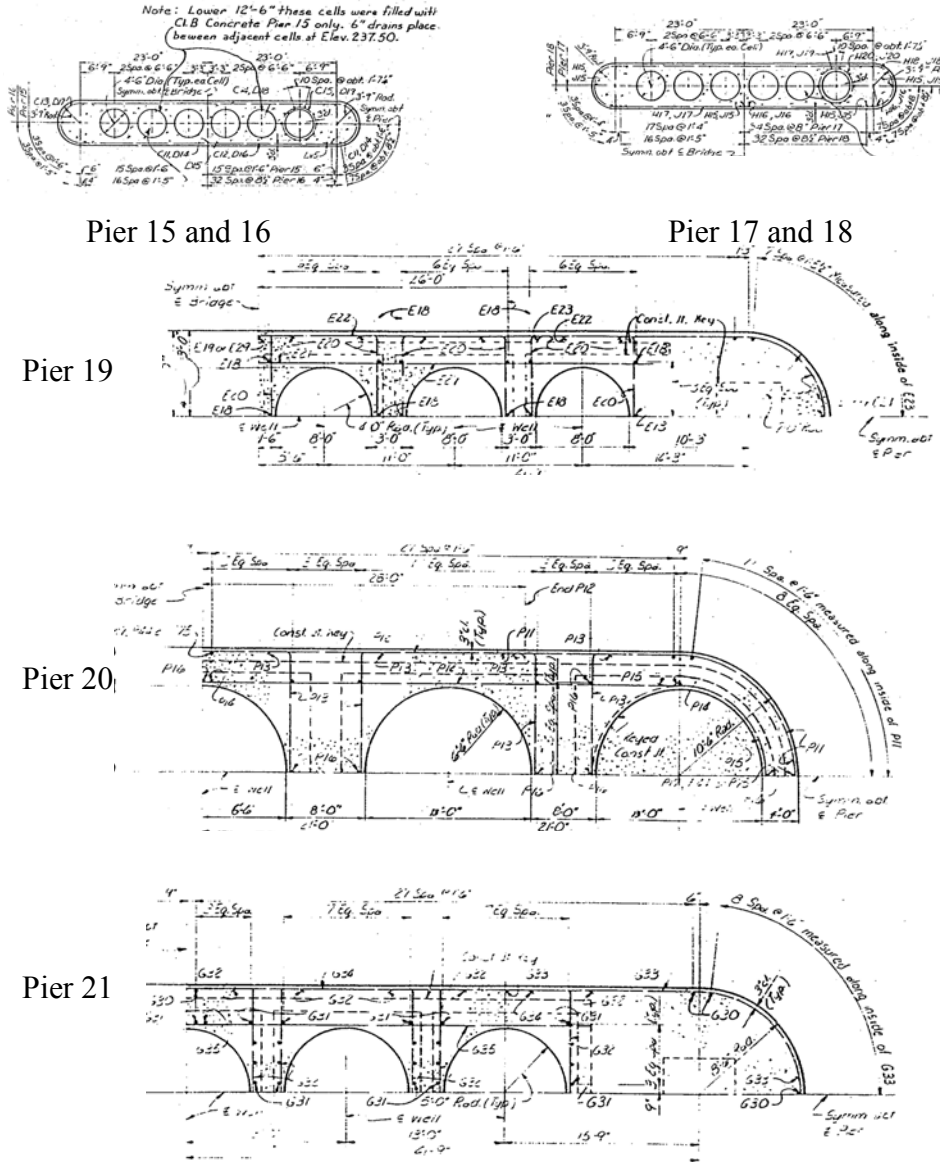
Cross-sections of Pier 15 to Pier 21
